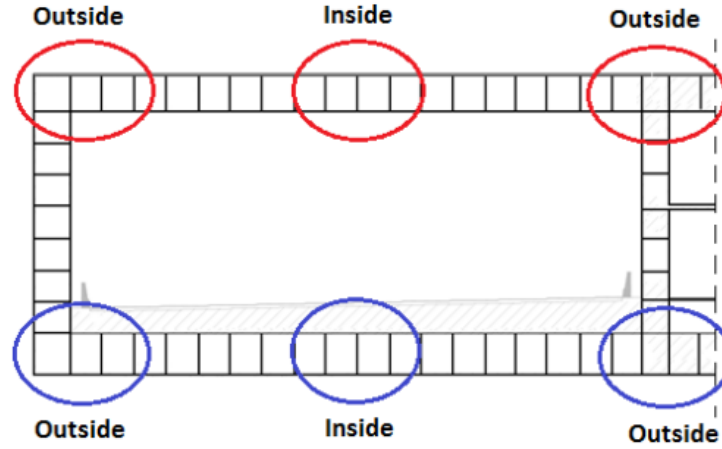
Outside and inside sections (roof: red, floor:blue)
